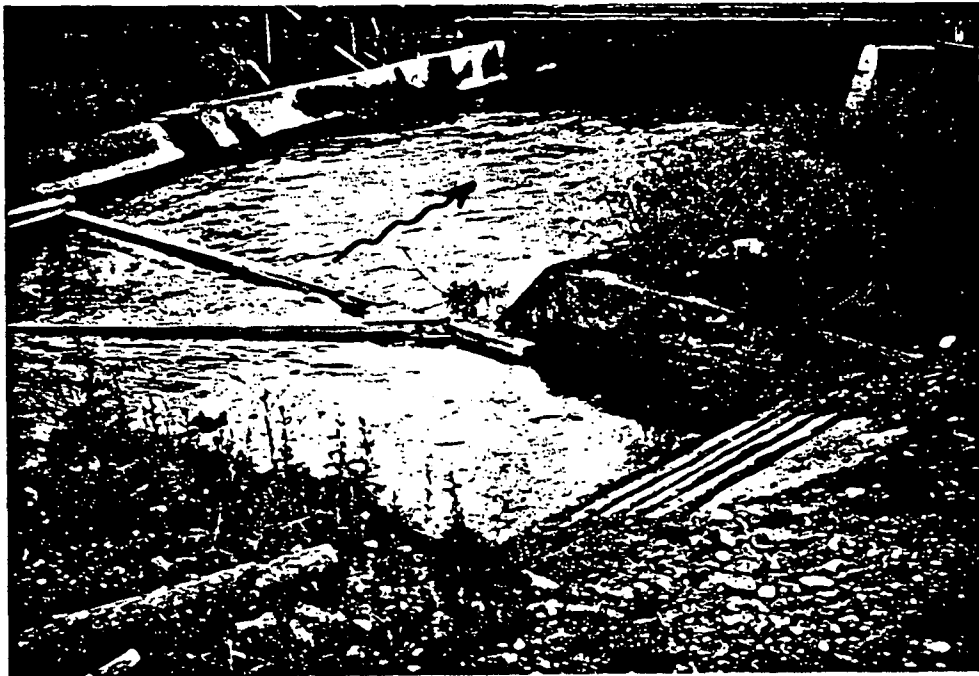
Concrete Escape Ramp With Low Slope (4h:1v) Built Into Indentation In Steep-Sided Canal. Note Timber Boom That Directs Swimming Animals Into Ramp. (Bureau Of Reclamation).
